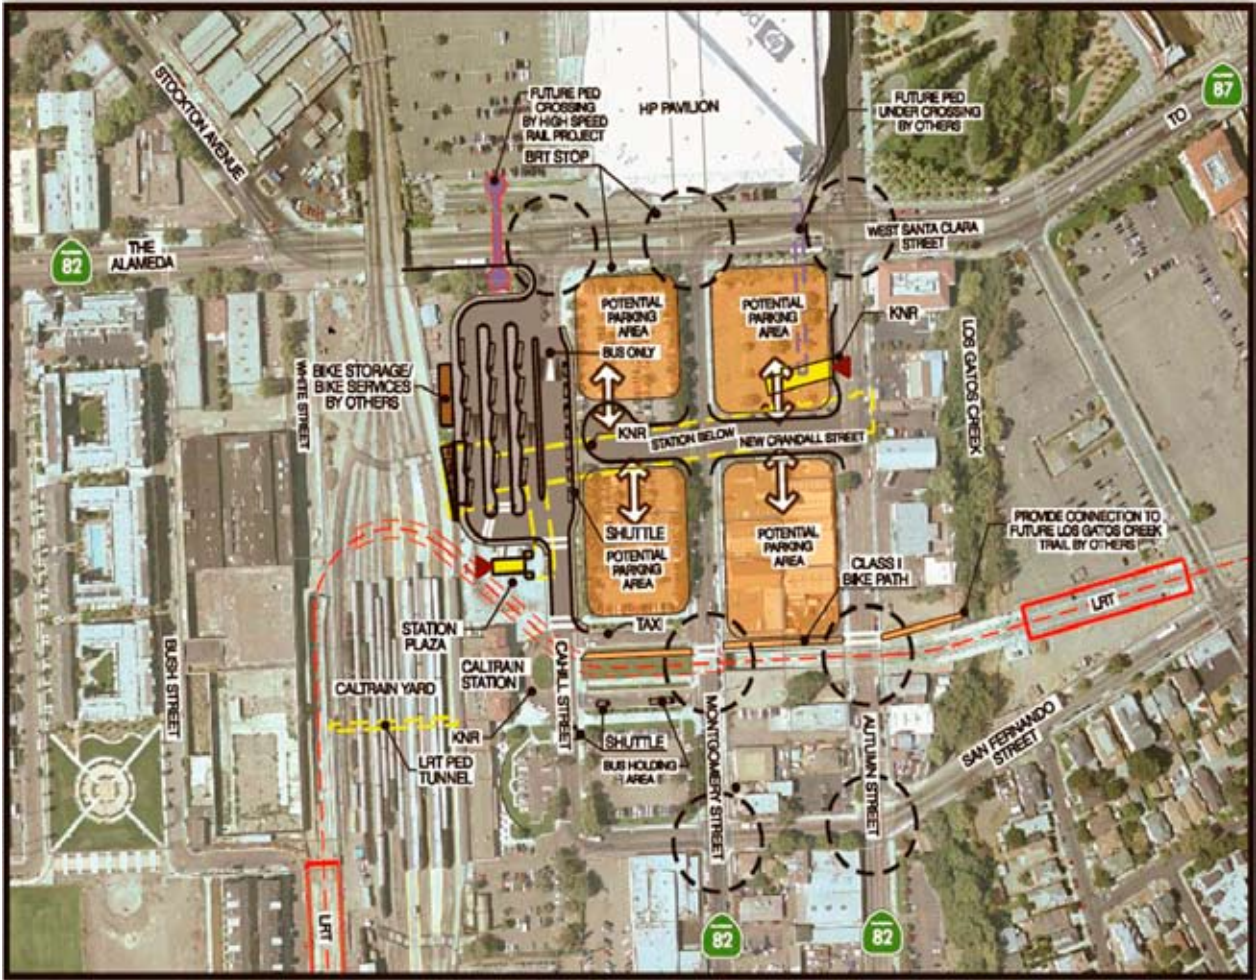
VTA DIRIDON/ARENA PROPOSED LAYOUT - DESIGN ALTERNATIVE 2
